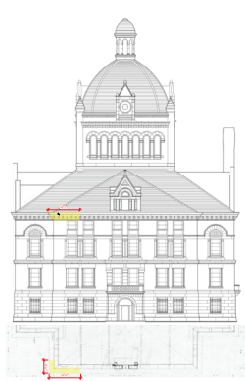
Location of probes on southeast corner of the upper tower (East) elevation.
